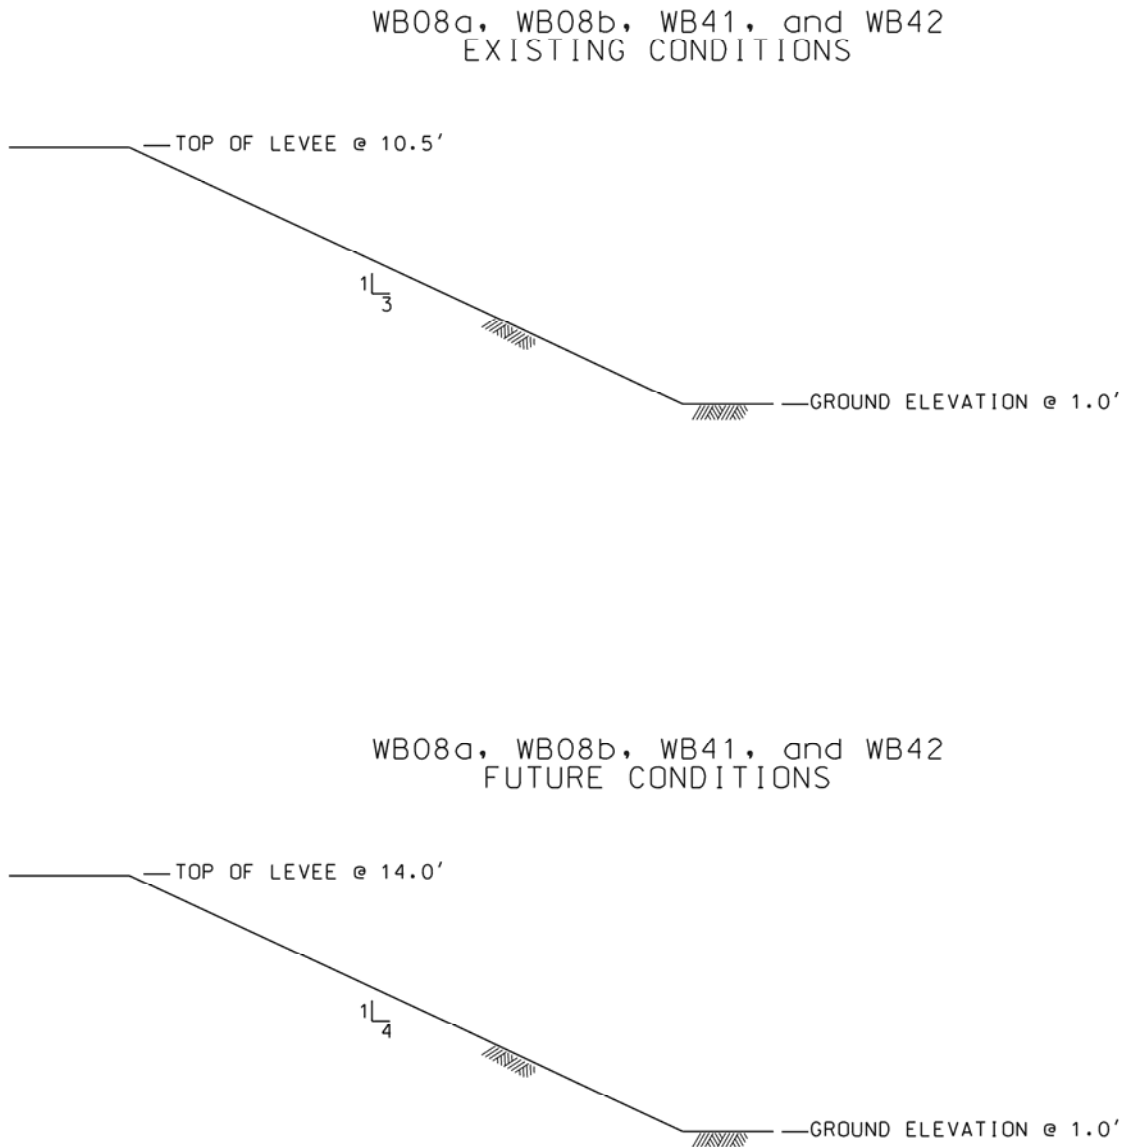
Typical Design Cross Section for Westwego to Harvey Levees (WB08A, WB08B, WB41 and WB42) for existing (upper panel) and future conditions (lower panel)
